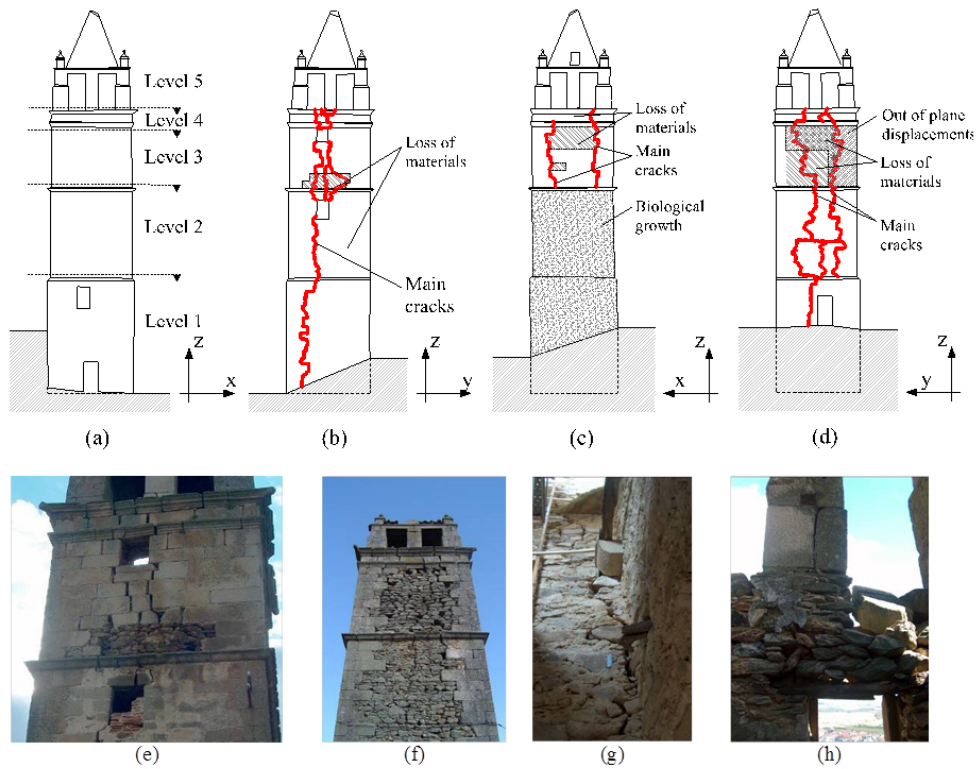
Damage in the tower: (a) South, (b) East, (c) North and (d) West façades; cracks on the (e) East and (f) West fronts; (g) inner crack in the West façade; and (h) example of material loss [44], [45].
